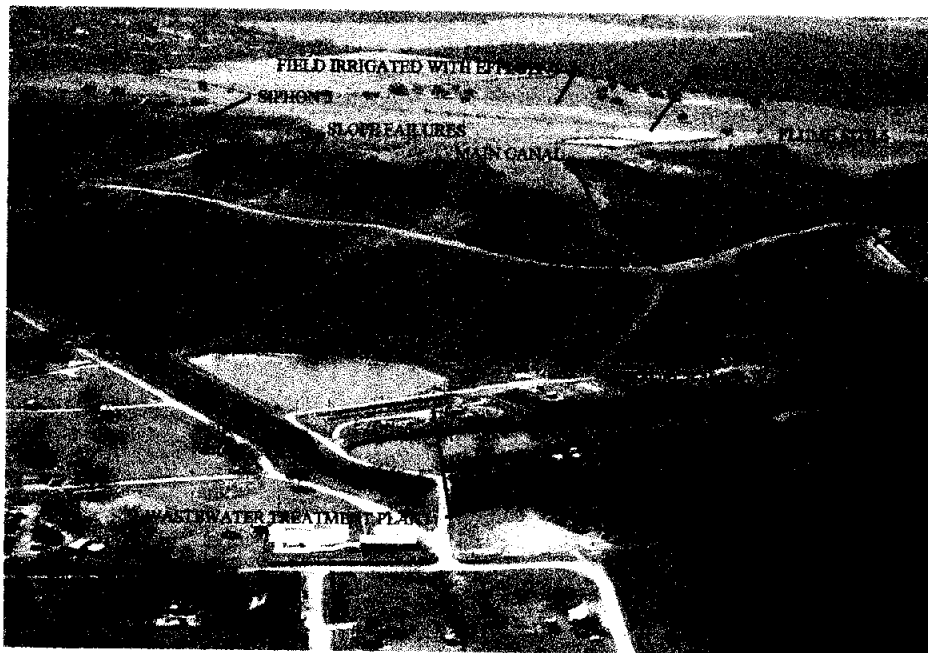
MAIN CANAL AT CASTROVILLE
